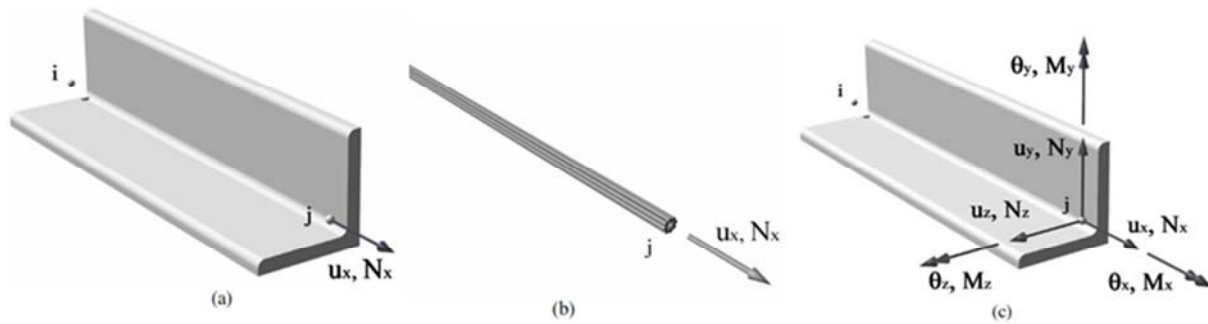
(a) Adopted spatial truss, (b) cable (tension only) and (c) spatial beam finite elements.
